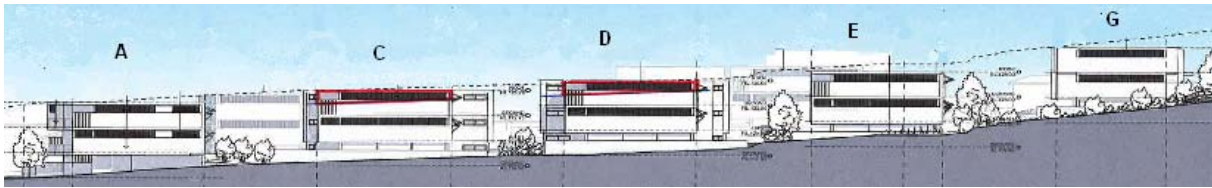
View of non-compliant building envelopes (marked in red) along the western elevation.
